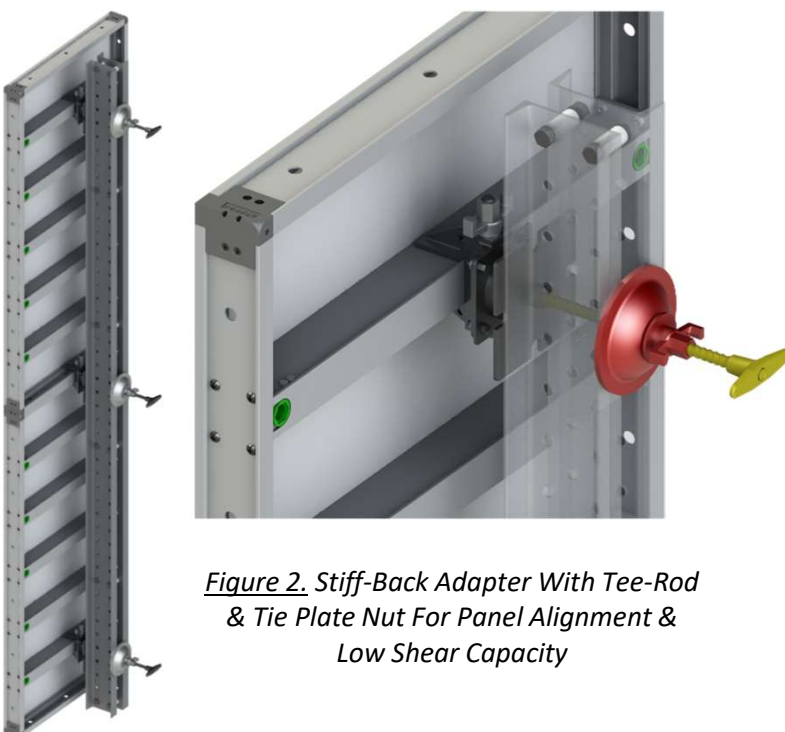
Stiff-Back Adapter With Tee-Rod & Tie Plate Nut For Panel Alignment & Low Shear Capacity
